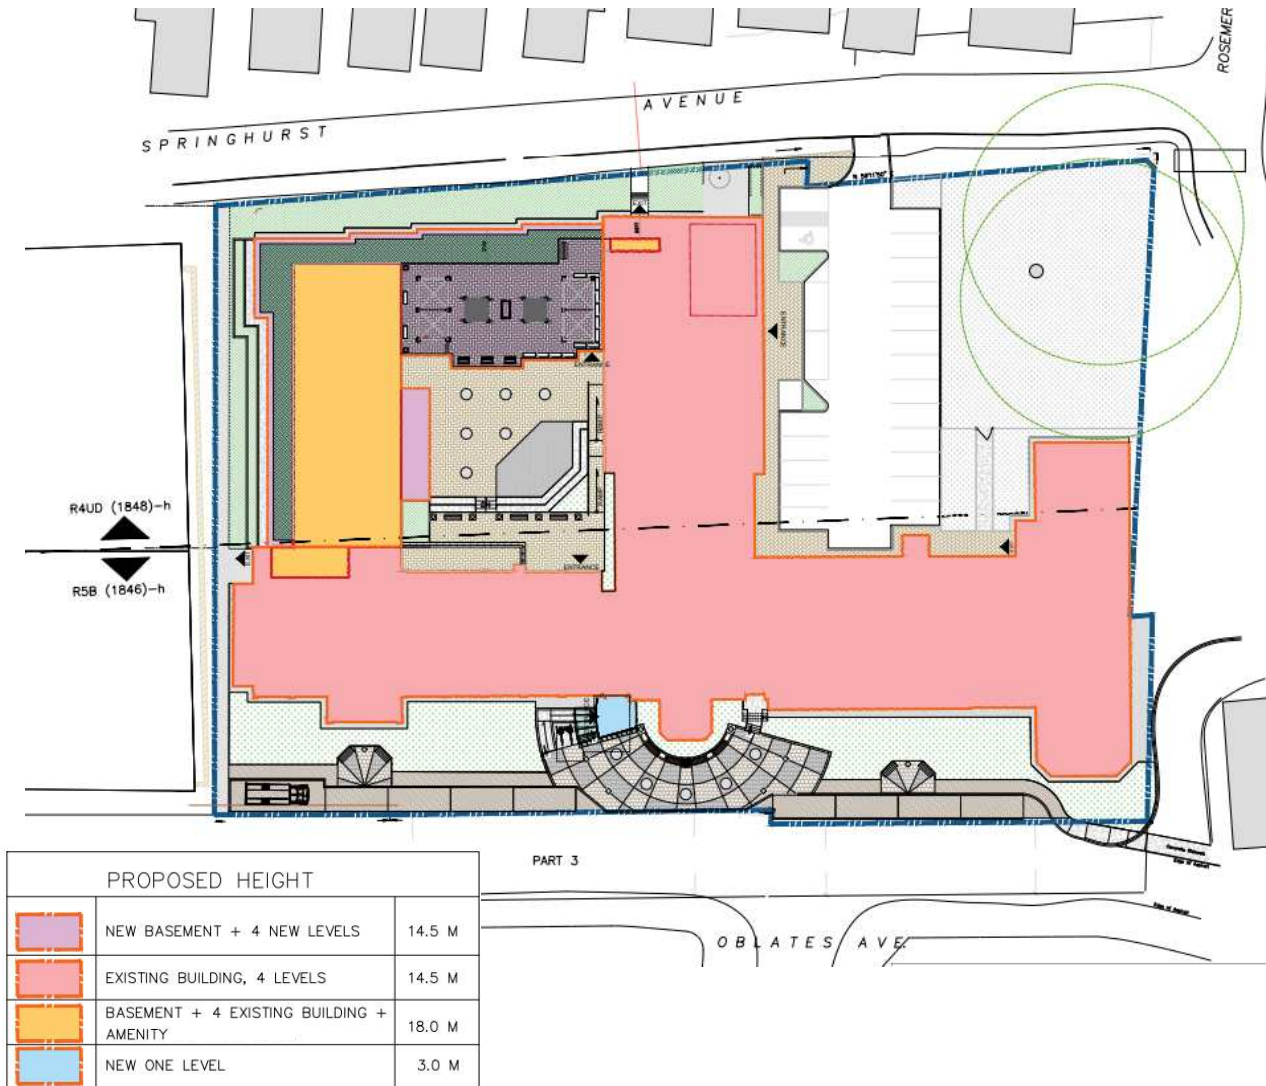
Illustrative Site Plan, extracted from the submitted architectural Site Plan
